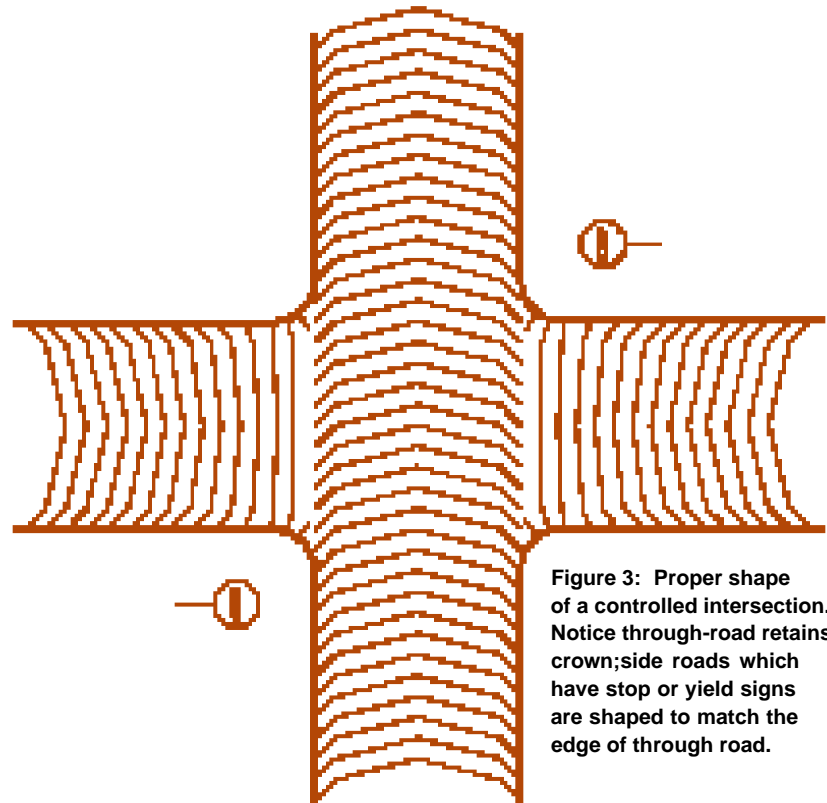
Proper shape of a controlled intersection. Notice through-road retains crown; side roads which have stop or yield signs are shaped to match the edge of through road.
